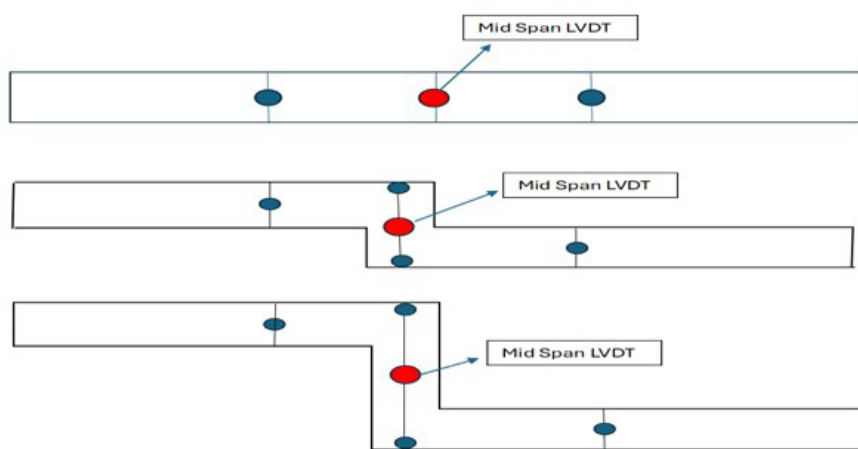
The LVDTs positions for beams soffit (mid-span was remarked).
